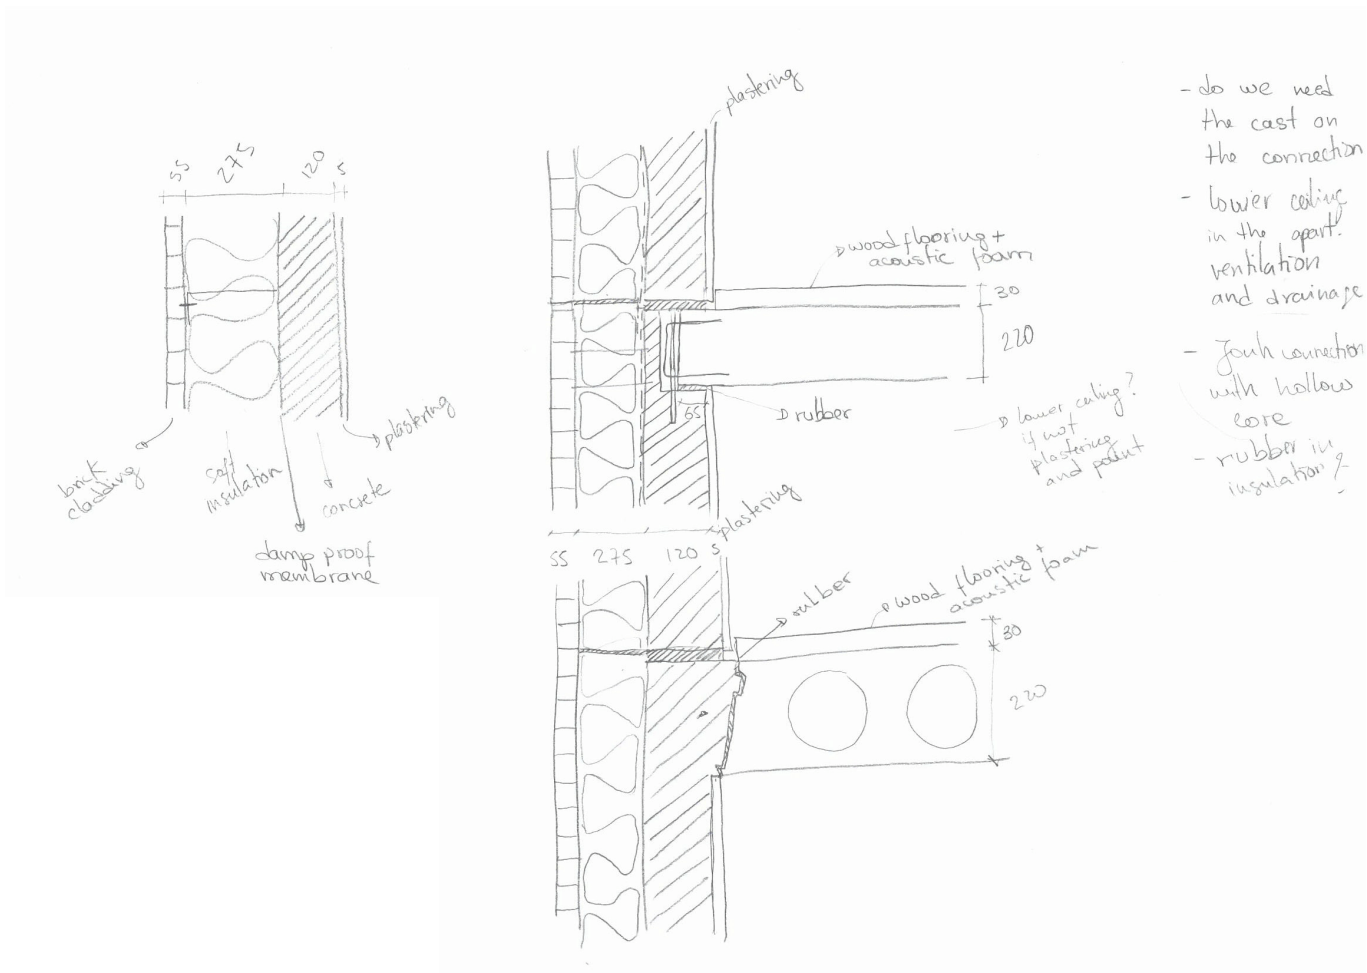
Sketches: of the slab connection with the wall, depending on the slab direction
